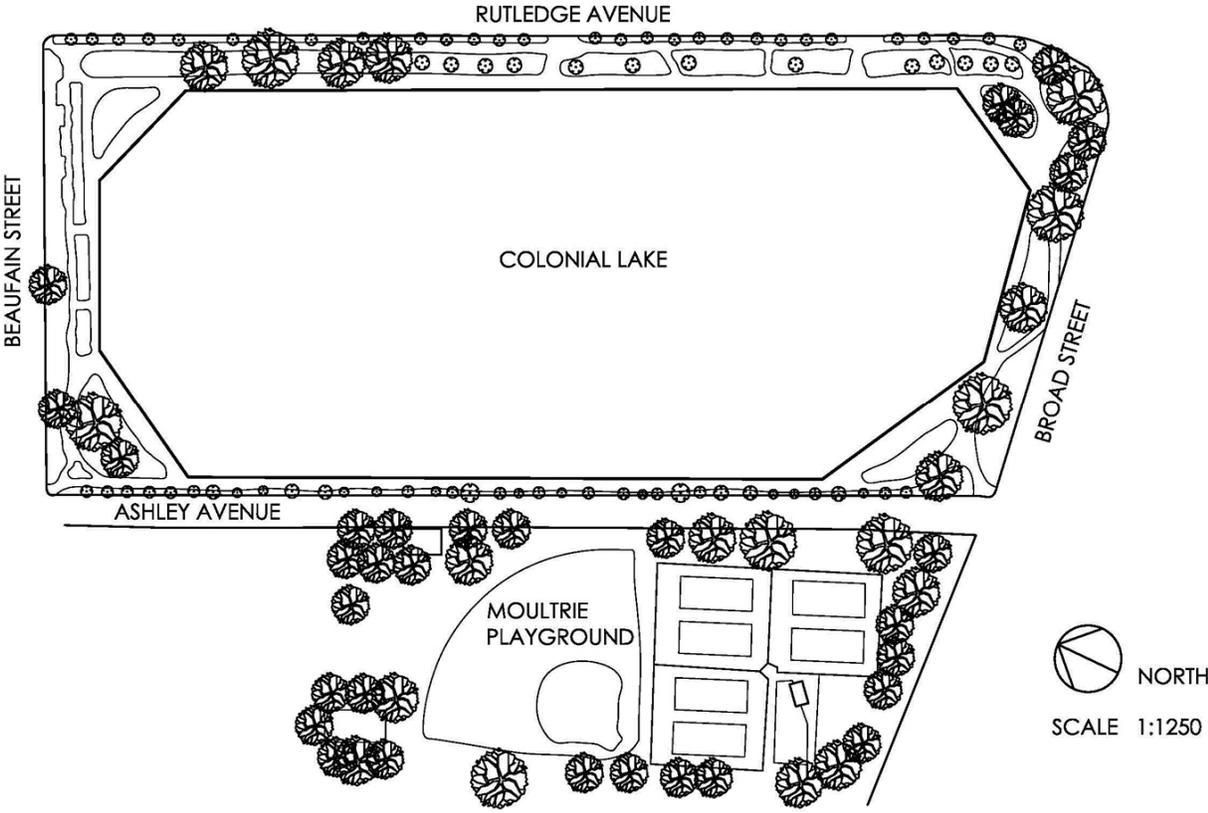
Colonial Lake site plan (Drawn by Mary C. Fesak, 2017).
